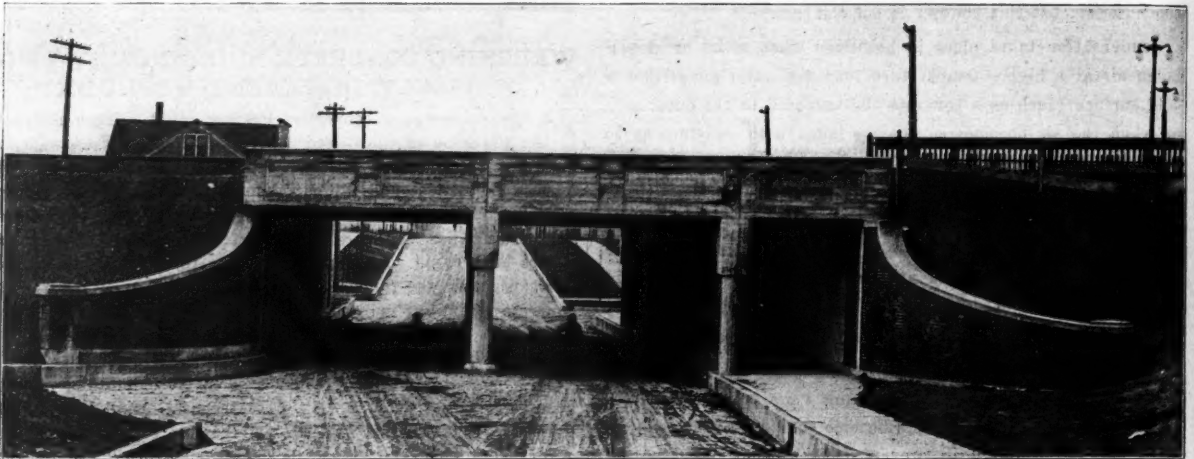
Illinois St. Subway, Flossmoor, Ill., Illinois Central R. R.—Looking West—Reinforced Concrete Deck Slabs and Piers, Plain Concrete Wings Faced With Brick.
